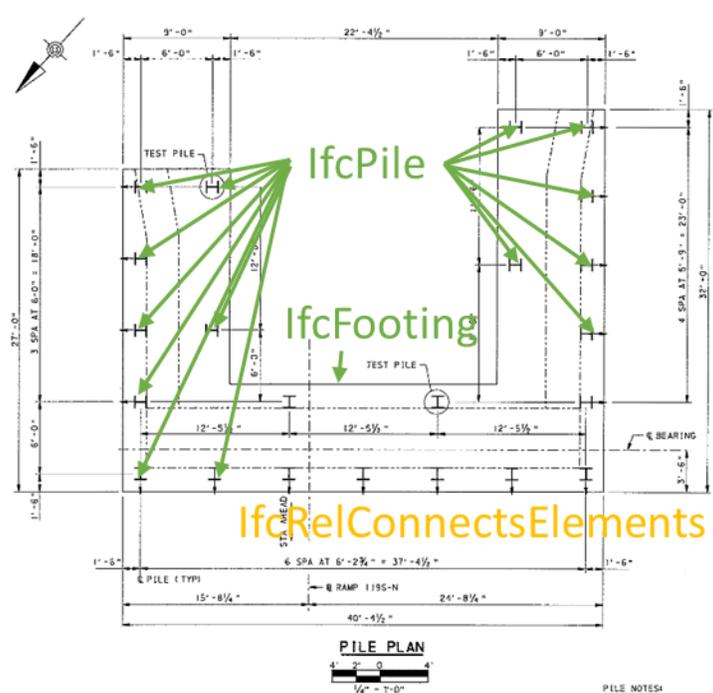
Penn Turnpike Abutment 1 Foundation Plan
